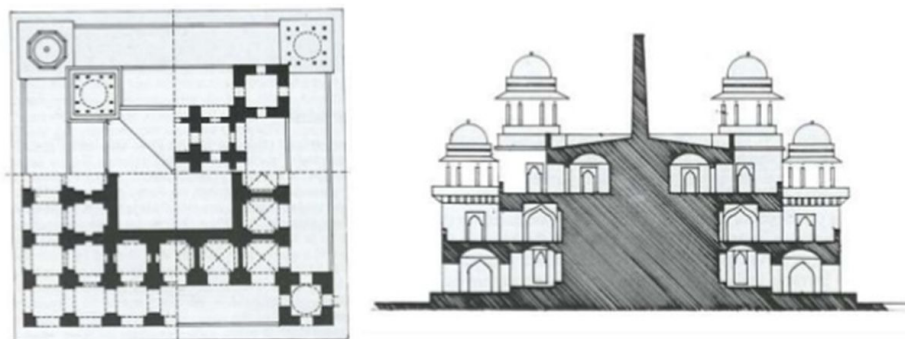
Plan (left) and Section (right) of Hawa Mahal at Firoz Shah Kotla, Delhi
